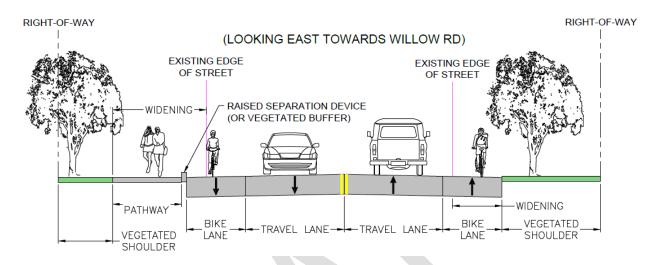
Coleman Avenue (Menlo Oaks) Preferred Long-term Alternative Cross Section Bike Lanes with Off-street Pathway
